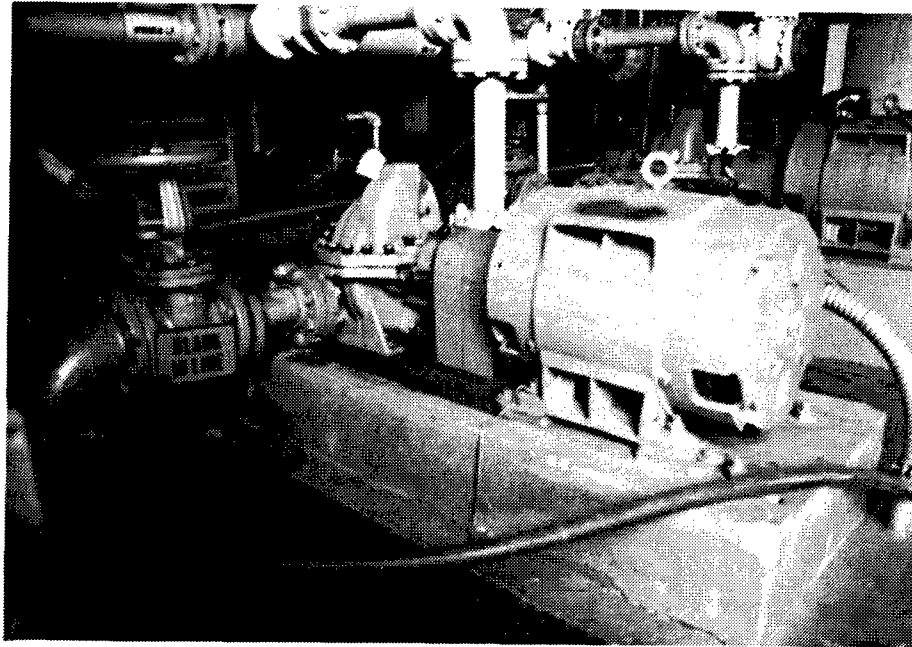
Building 1521: Low pressure centrifugal pump manufactured by Westinghouse and Worthington.
